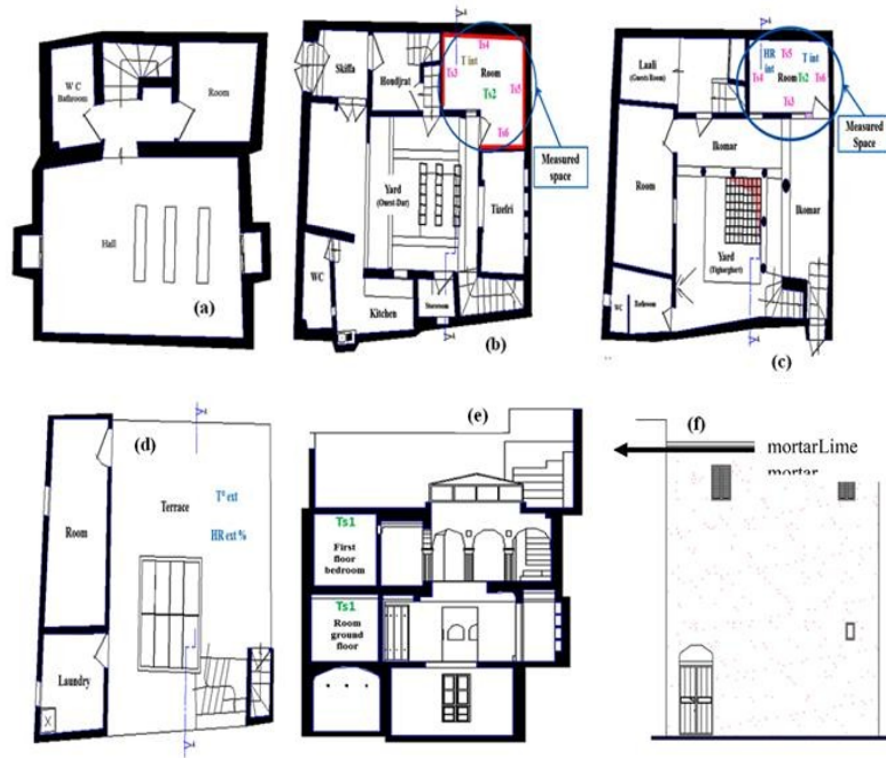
House plan: (a) Basement plan, (b) Ground floor plan, (c) First floor plan, (d) Terrace plan, (e) Section AA, (f) Façade.
